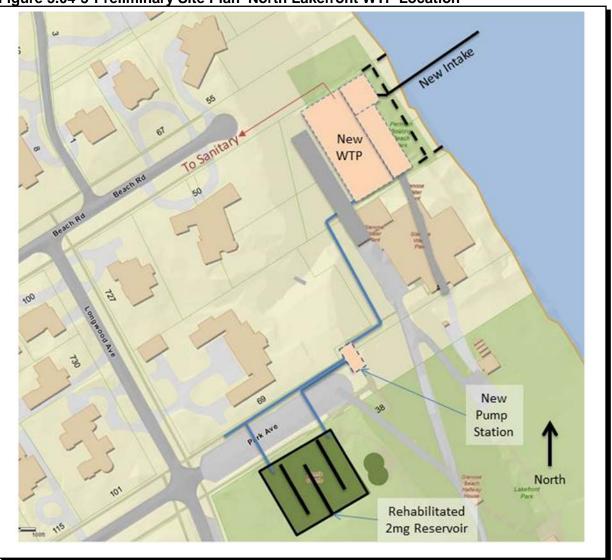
Preliminary Site Plan–North Lakefront WTP Location
